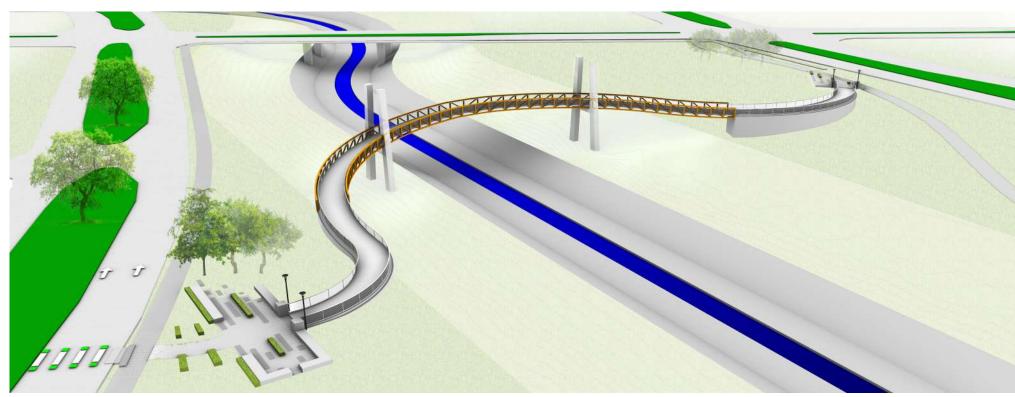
SIGNATURE BRIDGE ACROSS WHITE OAK BAYOU GREENWAY
